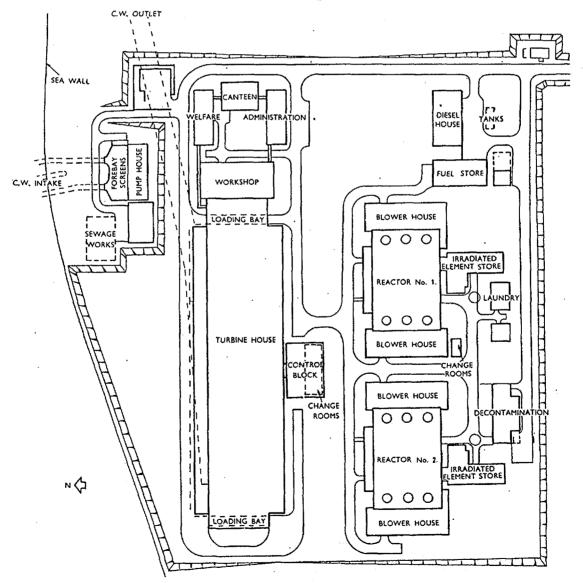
Site plan of Hinkley Point Magnox Station.
